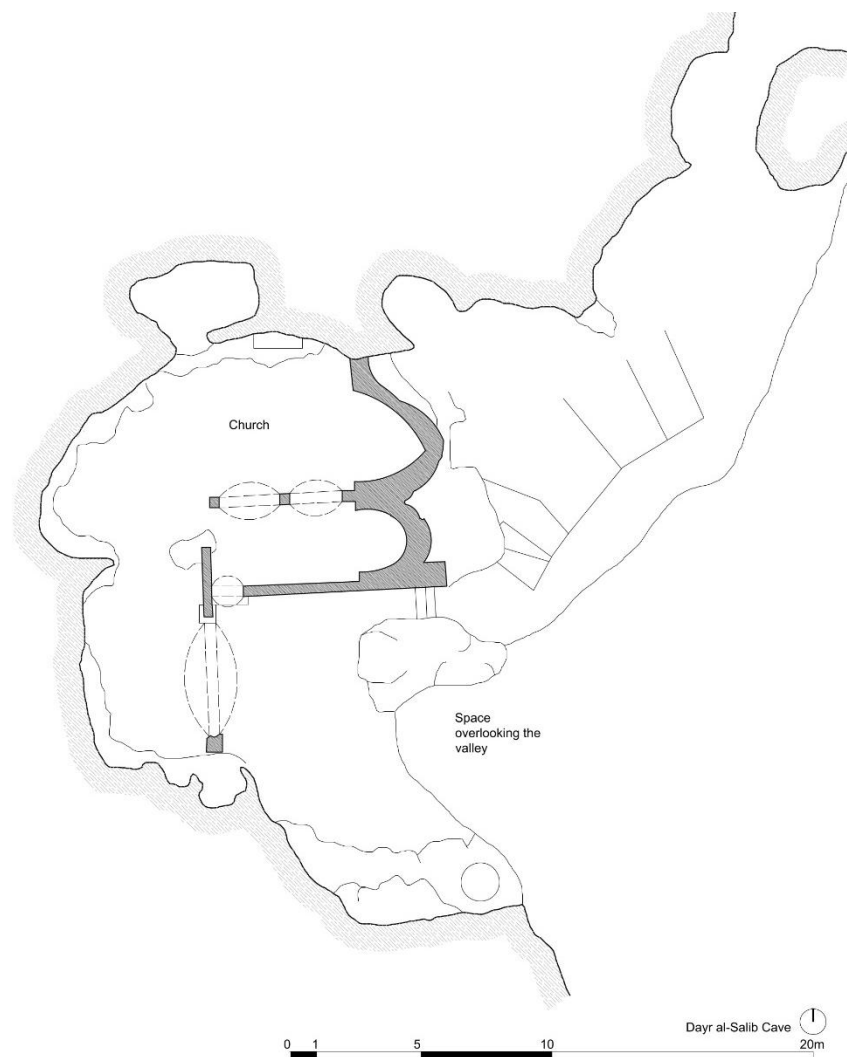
Floor plan of Dayr al-Ṣalīb cave, Ḥadshīt, drawn by the author based on the publication of Anis Chaaya.
